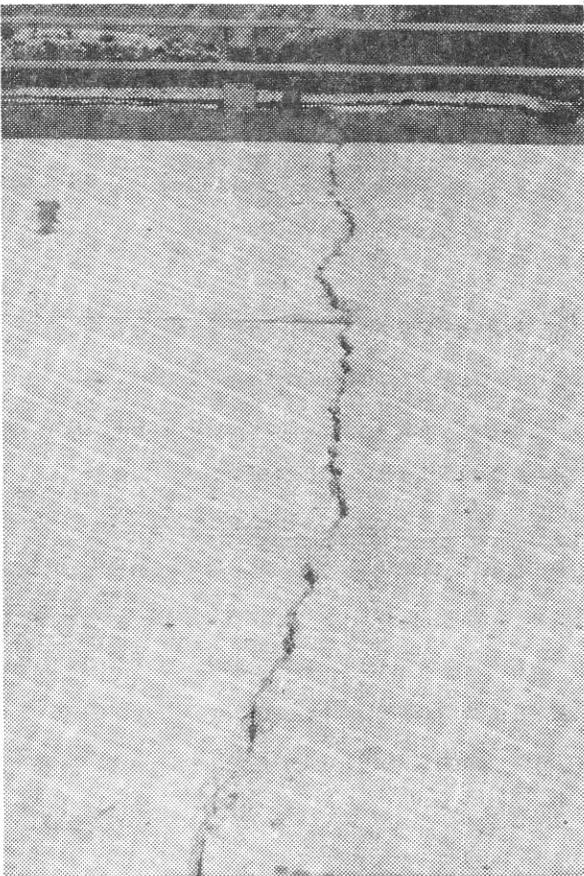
Transverse pavement crack at cut/fill contact near easterly approach to Bridge 53-1988 on the A-Y Connector.
